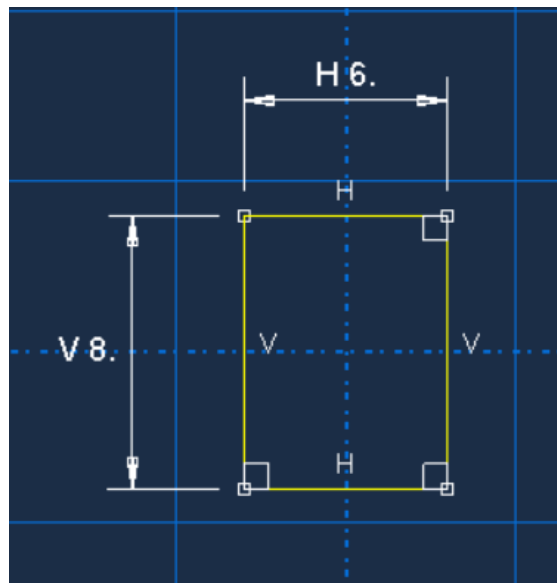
ABAQUS-SFRC Beam Cross Section (Units are inches)
